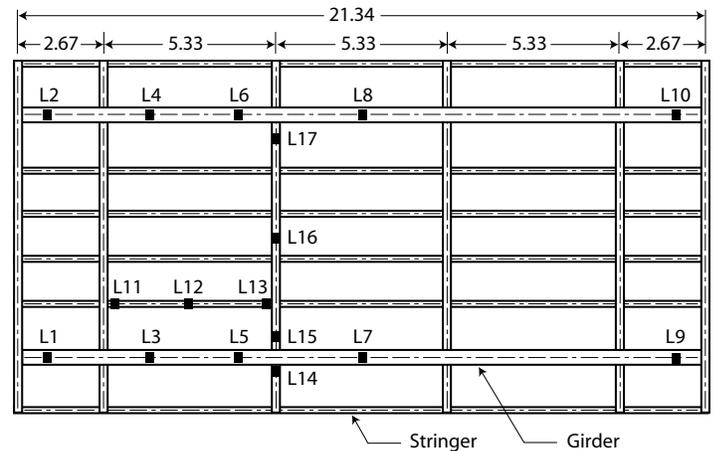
Representative instrumentation layout for a diagnostic load test of a two-girder bridge system with floor beams and stringers
